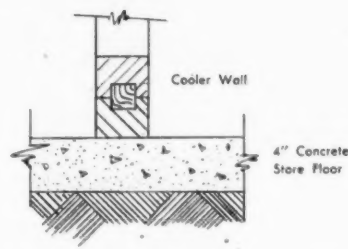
Cooler installed directly on uninsulated concrete store floor.
